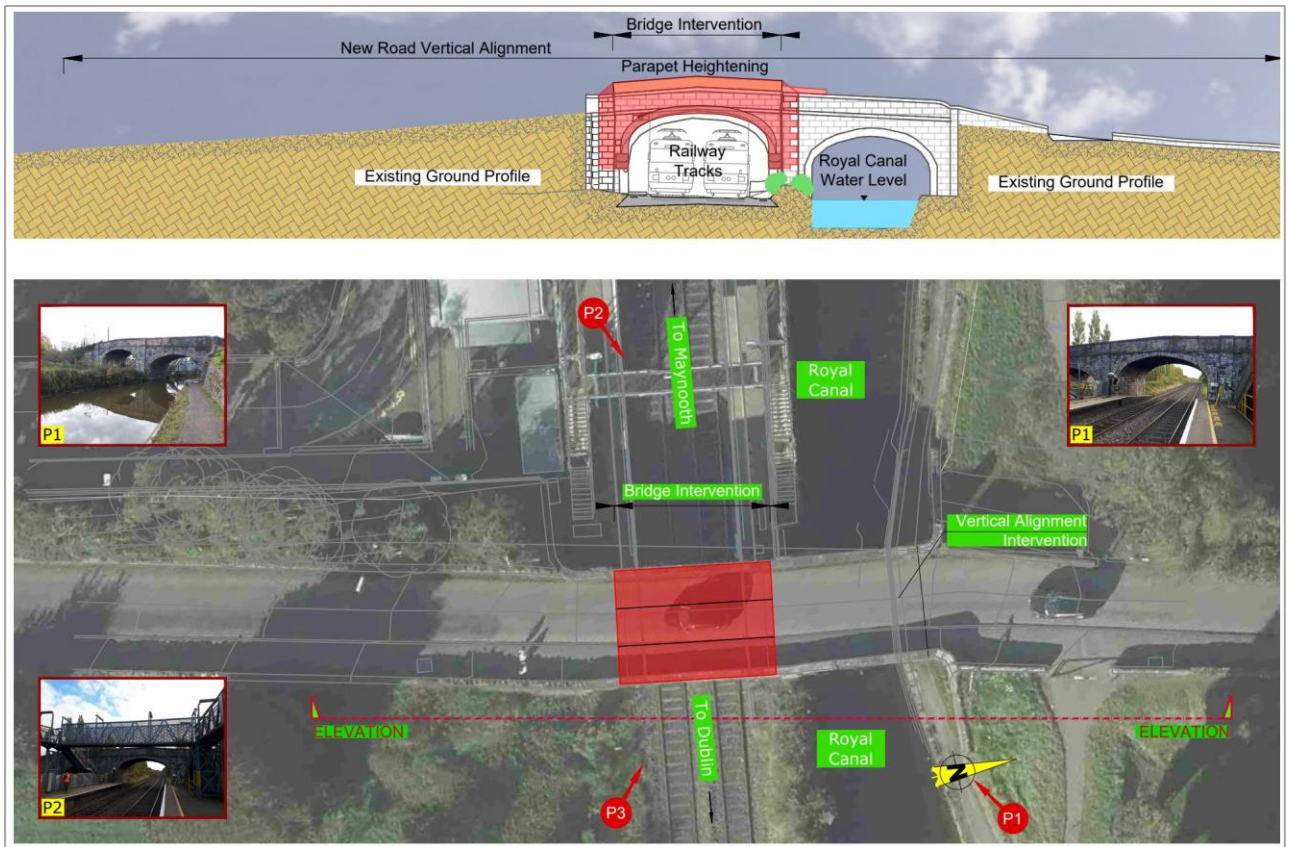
Railway Bridge Adjacent to Leixlip Confey Station Bridge Deck Reconstruction
